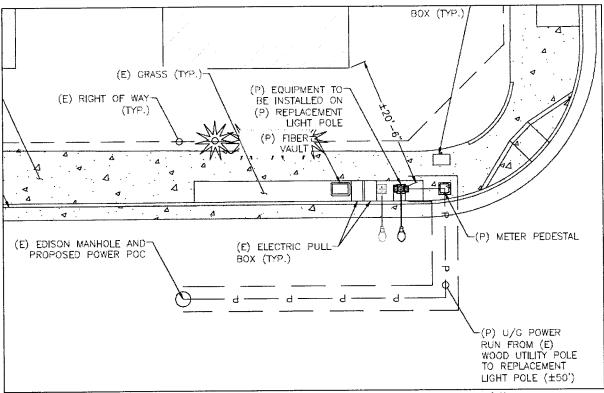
Underground electrical connections for the Applicant (Source: Plans page A-1, panel 1).
